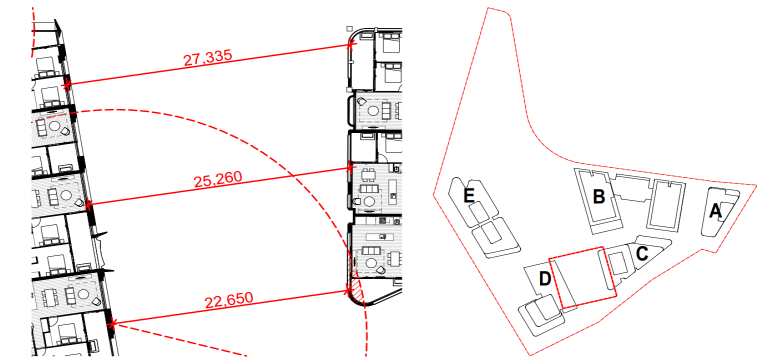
F1.4 Building D-C separation (storeys 1-9) & Key Plan
